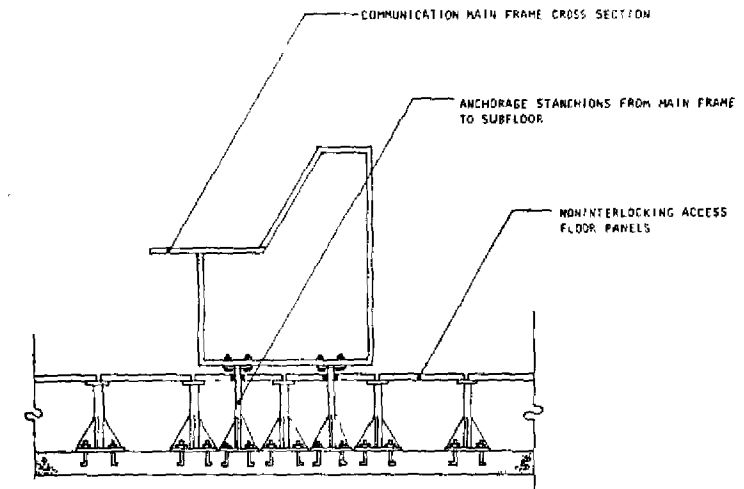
Communication systems. Main frame installation and anchorage for interlocking access floor.
